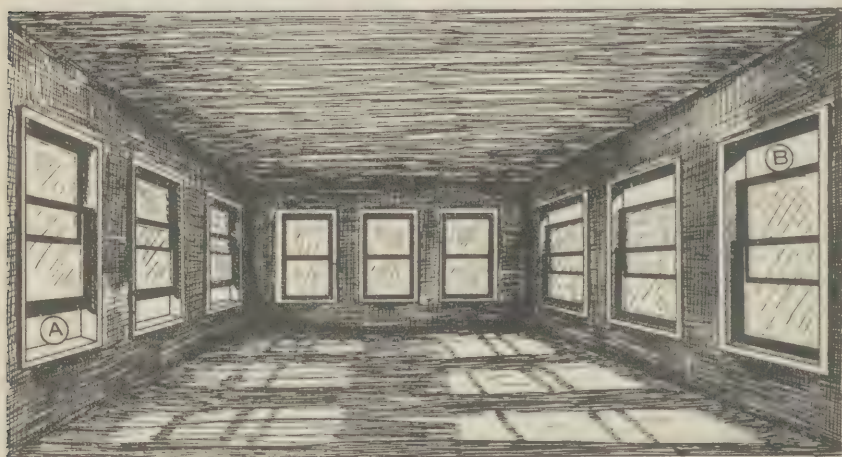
Ventilation of squad rooms showing method of arranging window openings. A—Inlet. B—Outlet..
